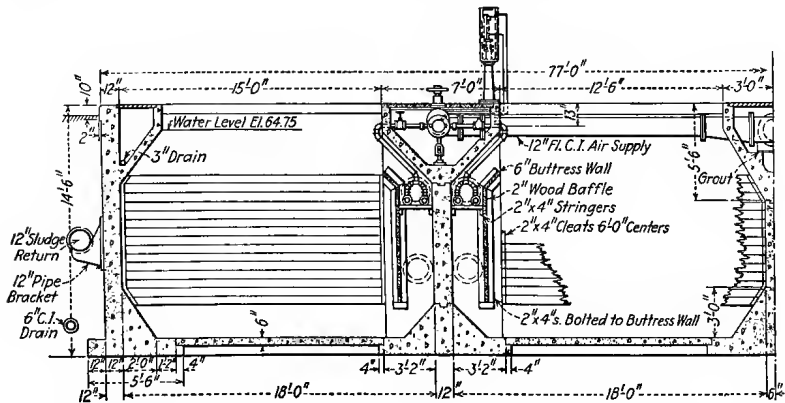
Cross section of aeration tank at Woonsocket, R. I.
